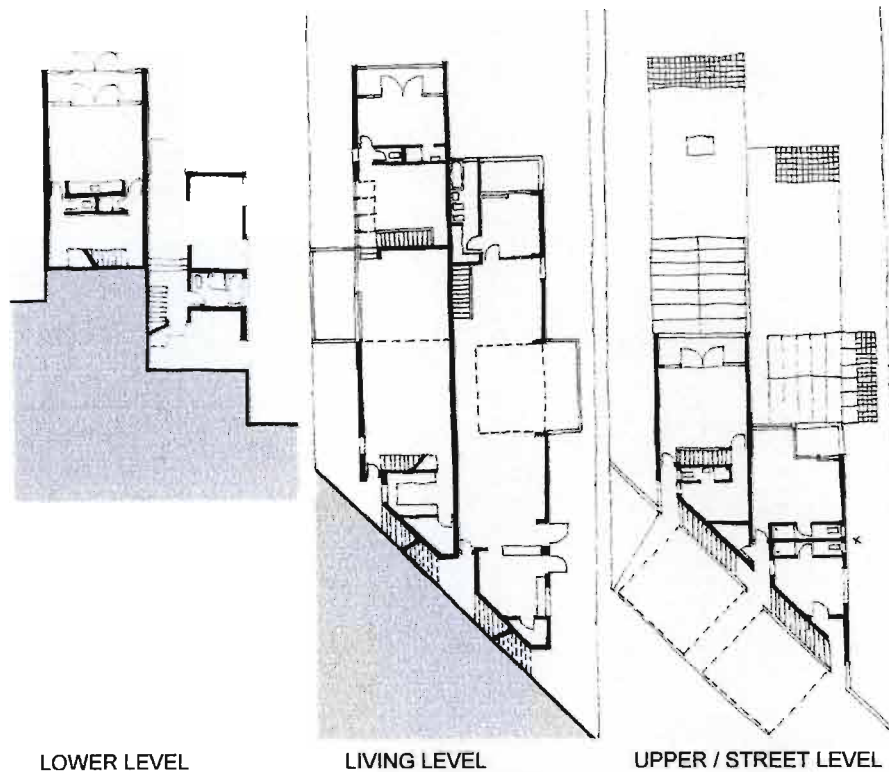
BDG – Teambuild (1976) – Typical pair of maisonettes. Plans
